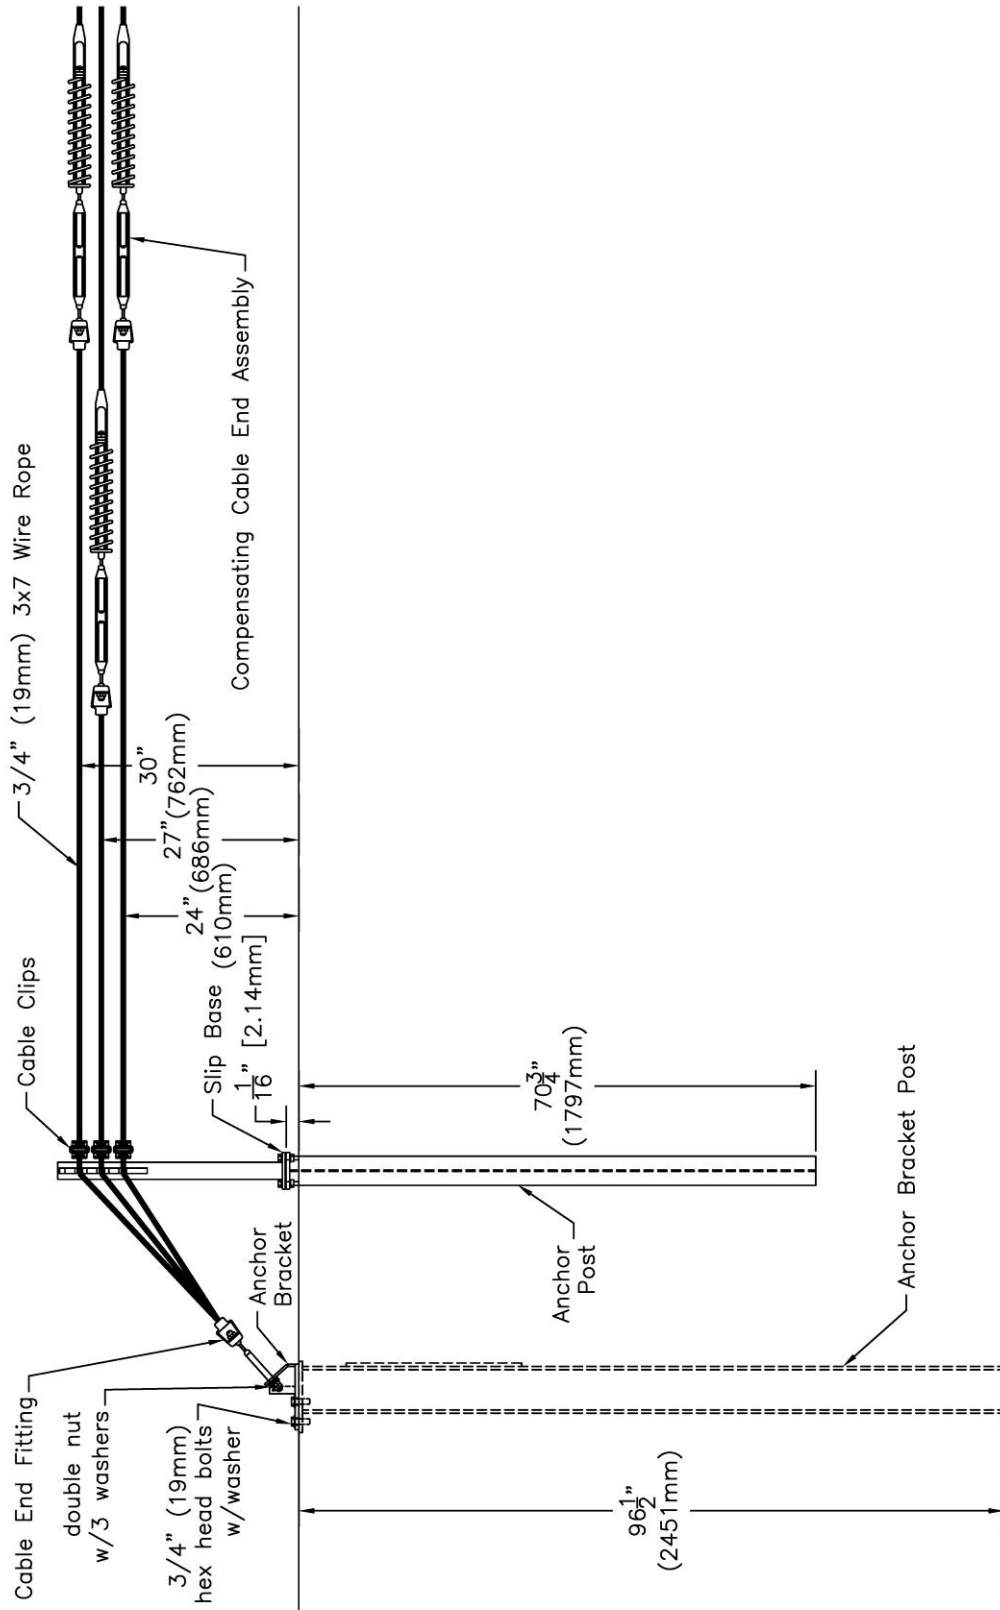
End Post and Compensator Assembly Details, Test No. CS-1 [44]
